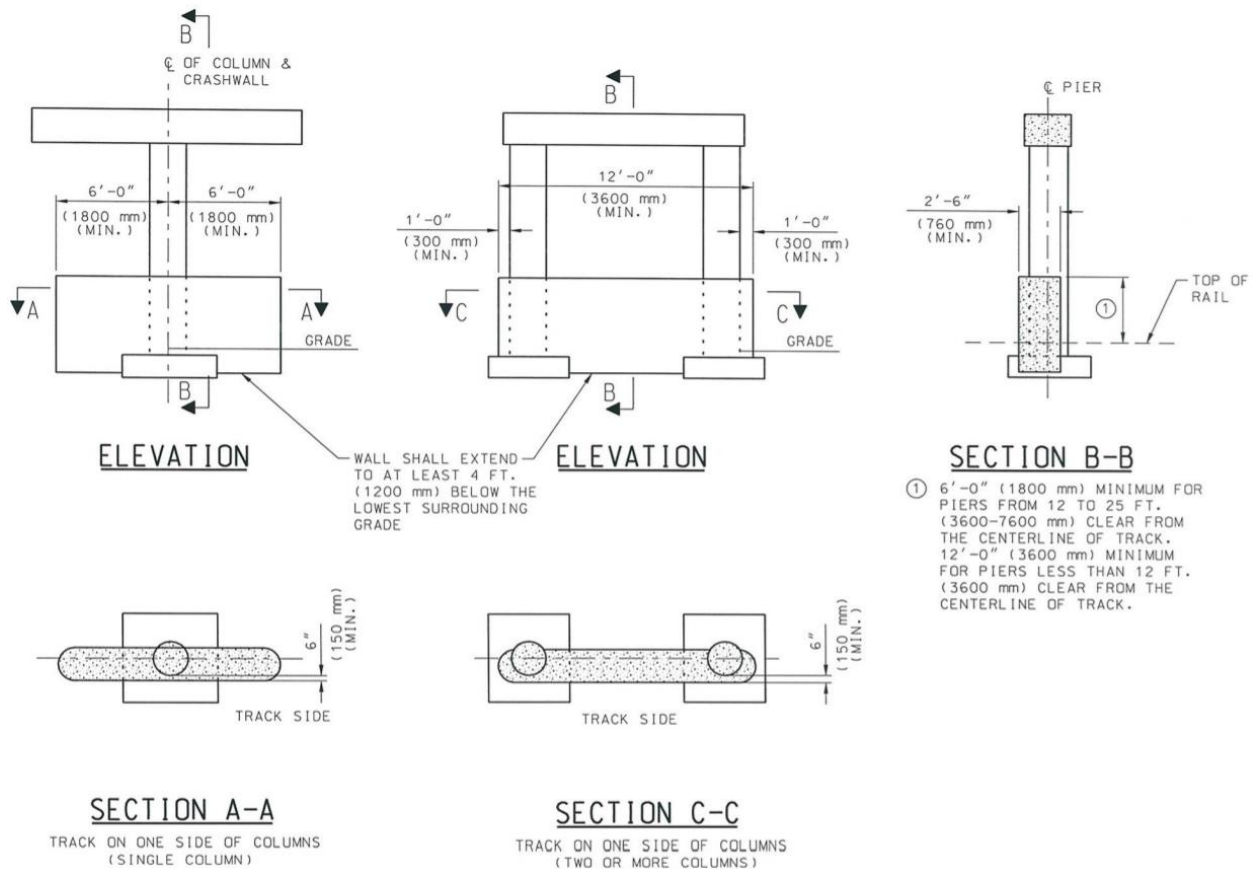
Frame pier with crash wall requirements in AREMA (2014)
